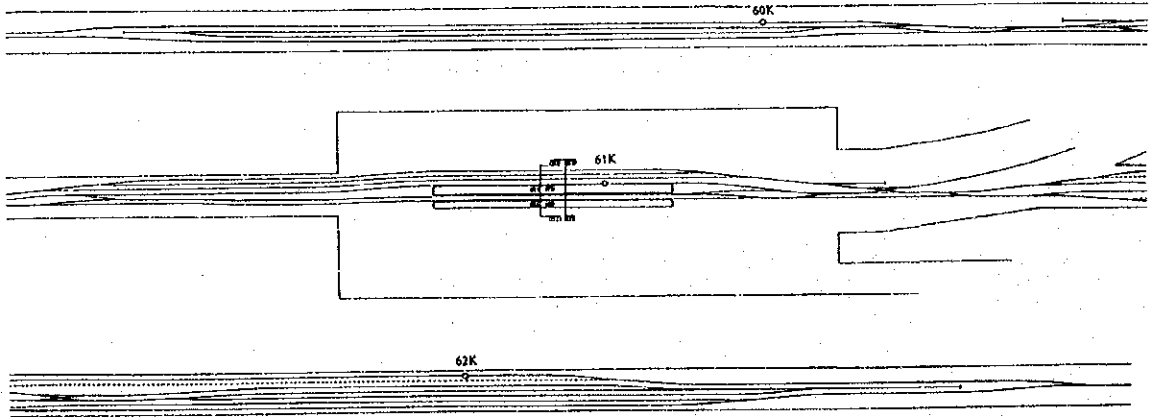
Track Layout of Chachoengsao Sta.
